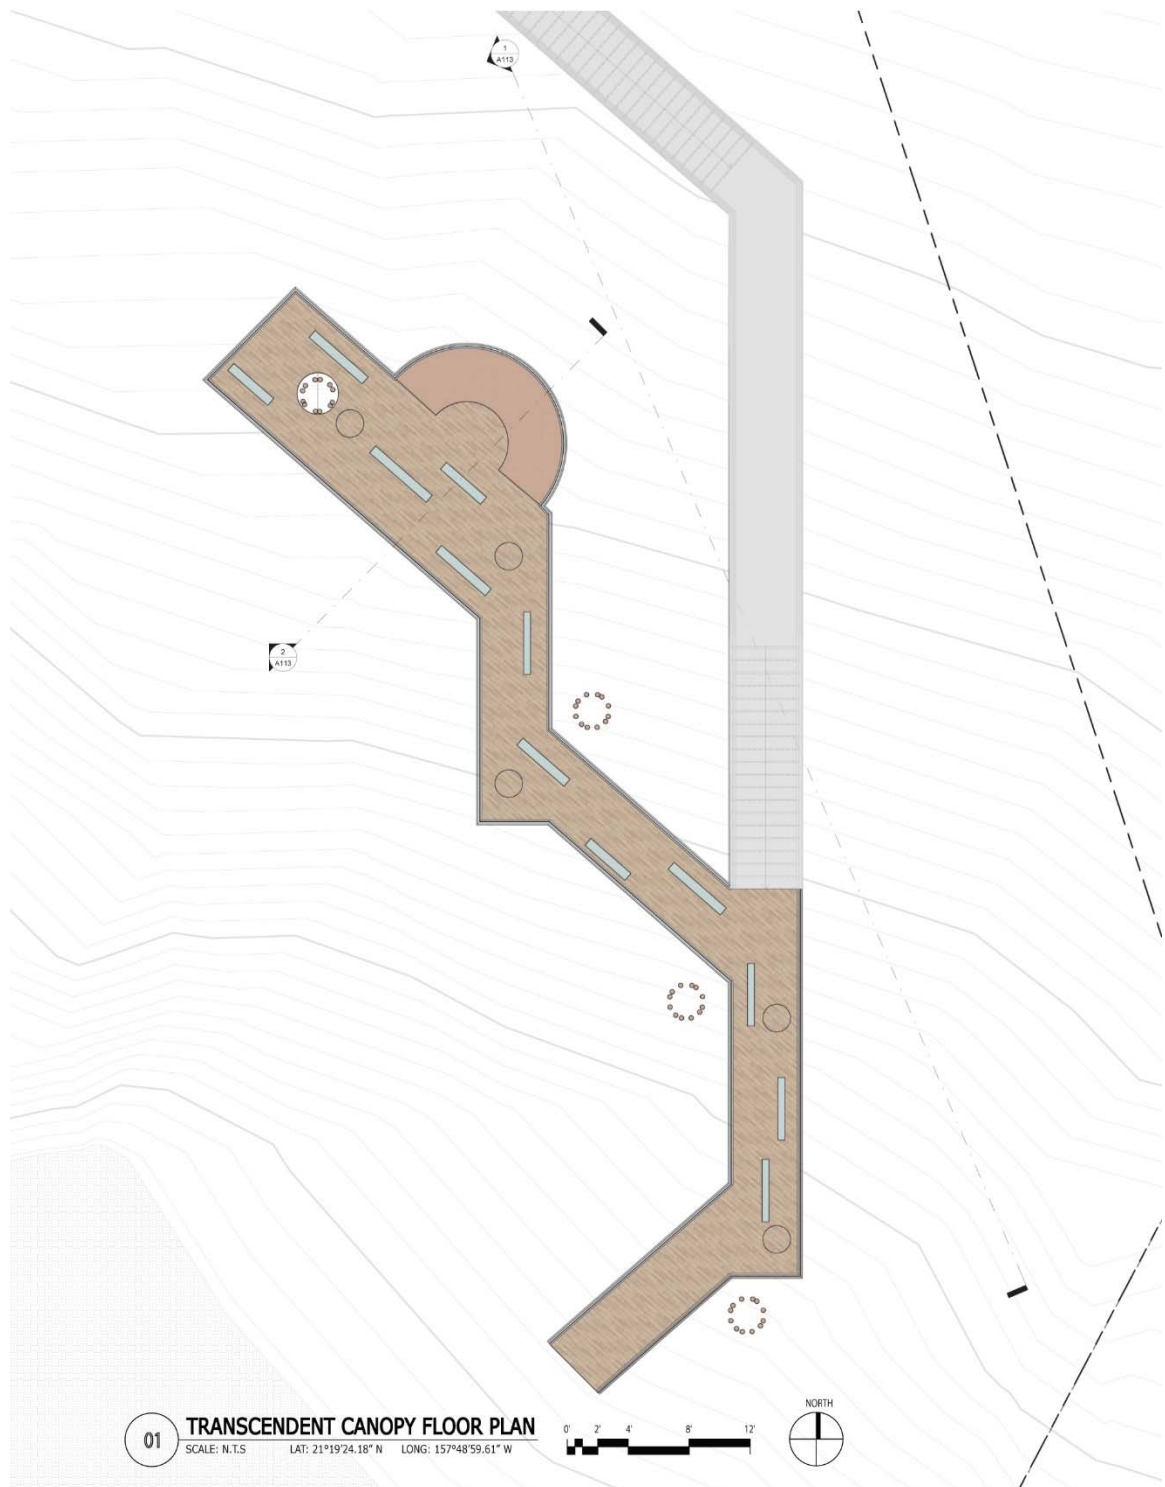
Transcendent Canopy Floor Plan. Made by Author.
